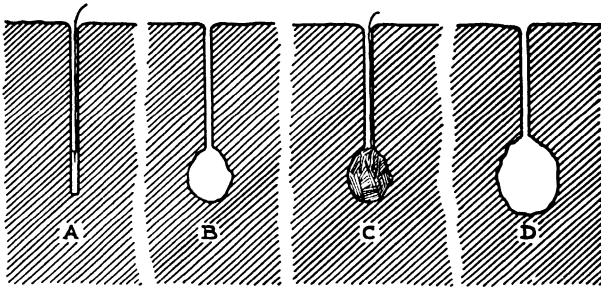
Chambering and Springing. A—drill hole with springing charge; B—sprung hole; C—chambering charge; D—chambered hole.
